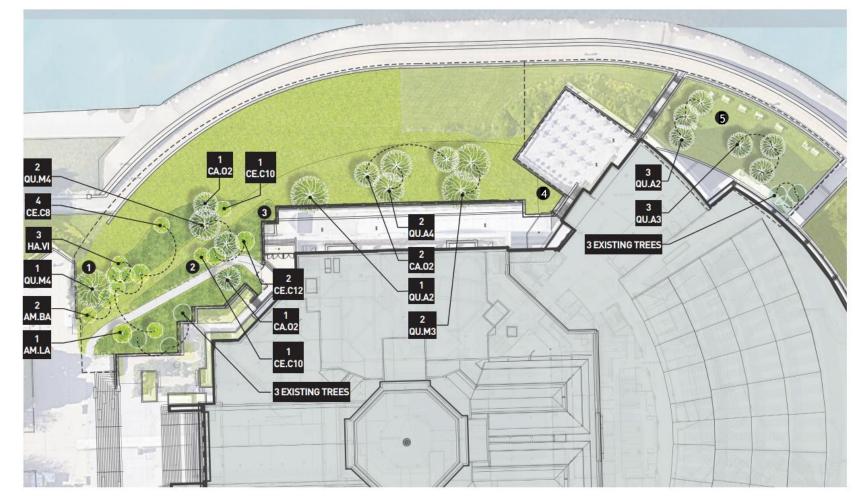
PLANTING PLAN ENLARGMENT OF THE NORTH SIDE
